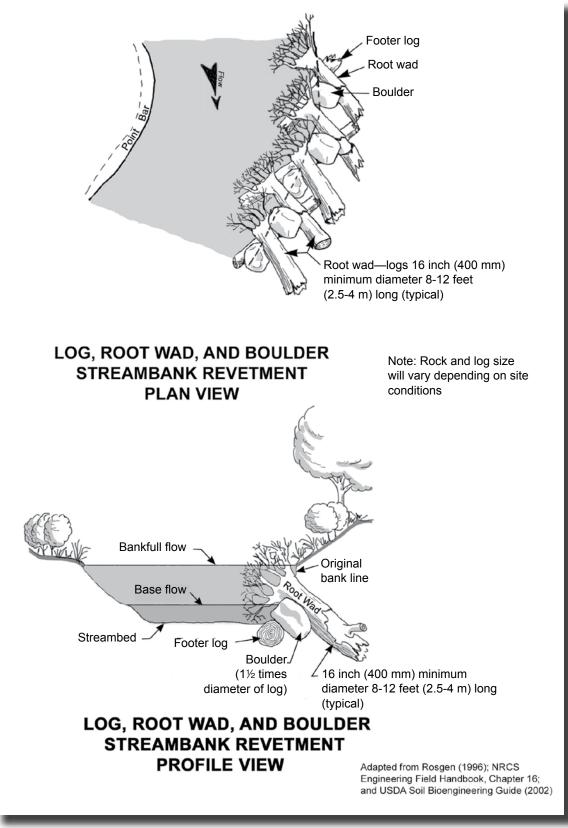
Log, rootwad, and boulder streambank stabilization measures.
